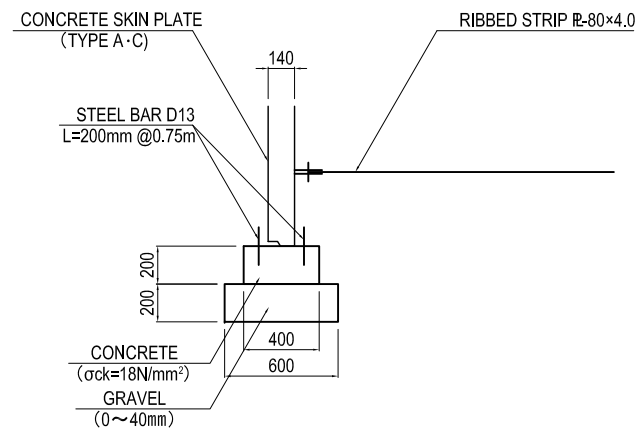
DETAIL OF MECHANICALLY STABILISED EARTH WALL(3)
